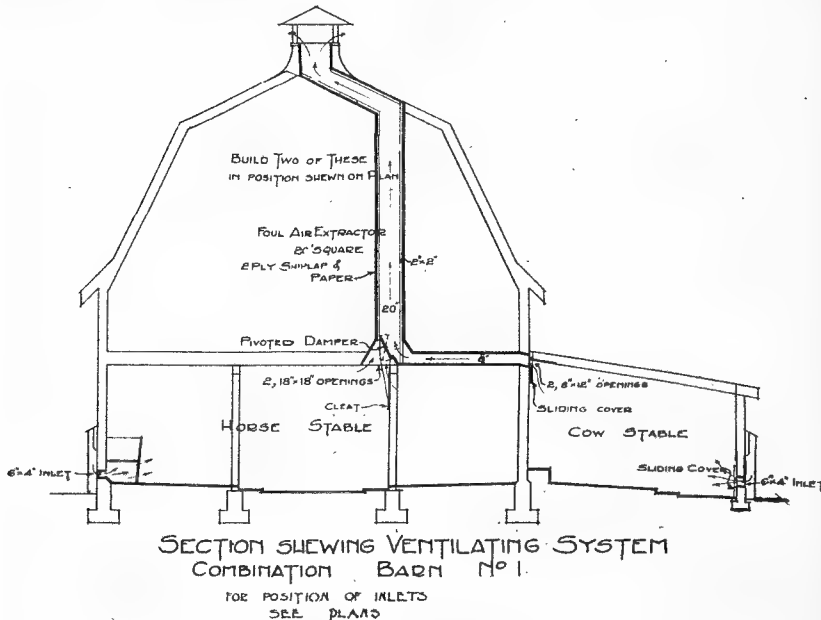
The foul air shafts should be constructed of two thicknesses of boarding with tar paper between.
